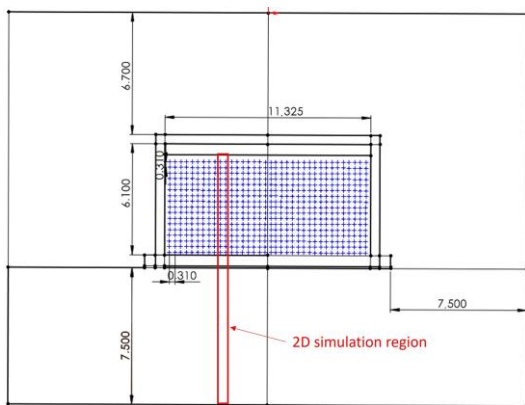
Cross section of 3D model of the tank with surrounding ground.
